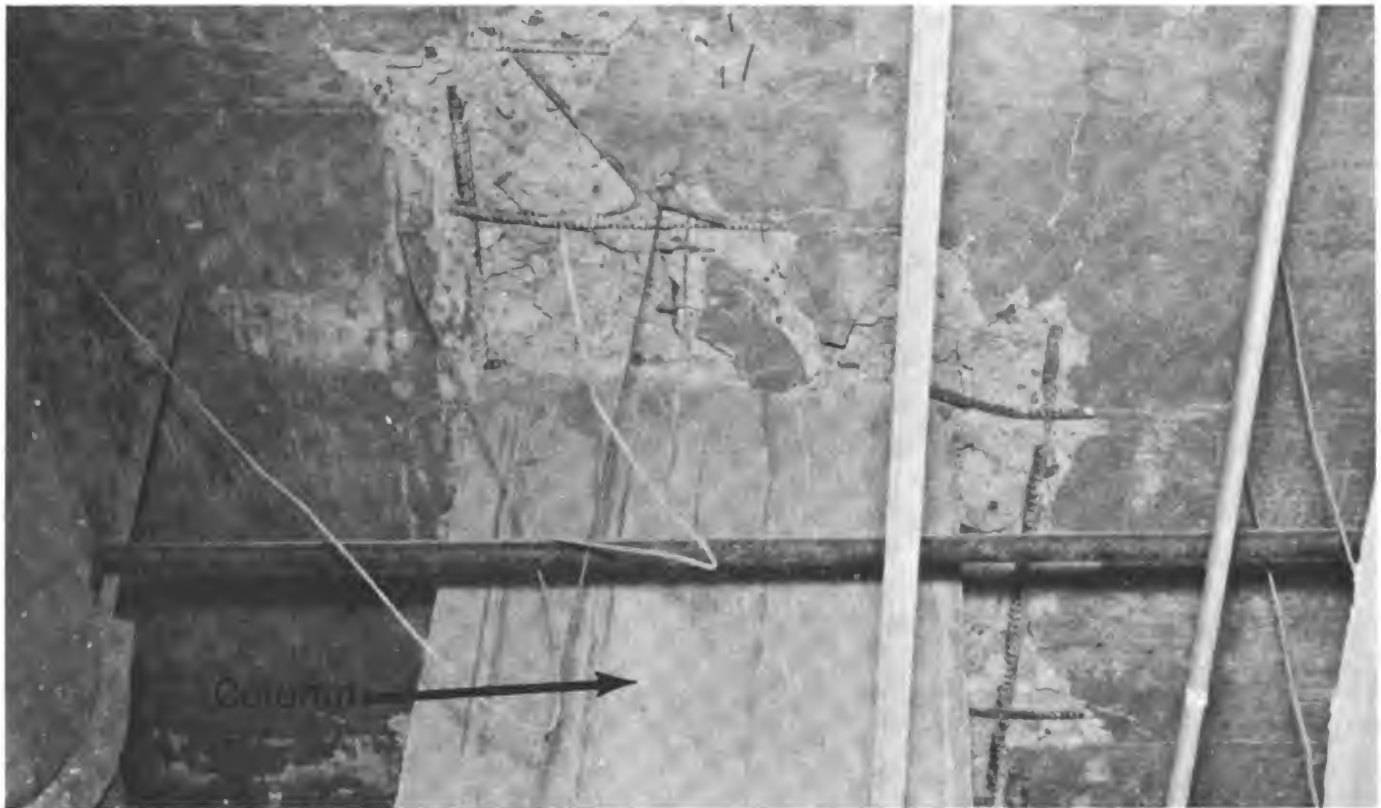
Olive View Hospital, medical treatment and care unit. Spalling of concrete slab under second-floor framing caused by rotation through connection.
